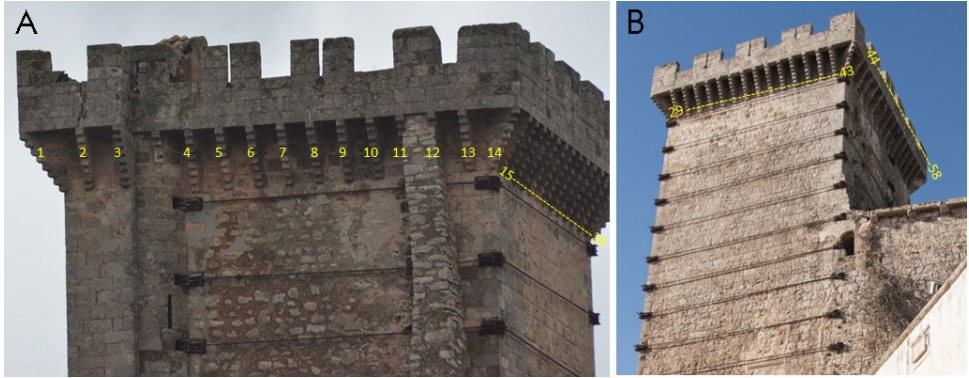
The castle of Ceglie Messapica. Numbering of corbels: A) Northeast and Southeast sides; B) Northwest and Southwest sides (authors, 2024).
